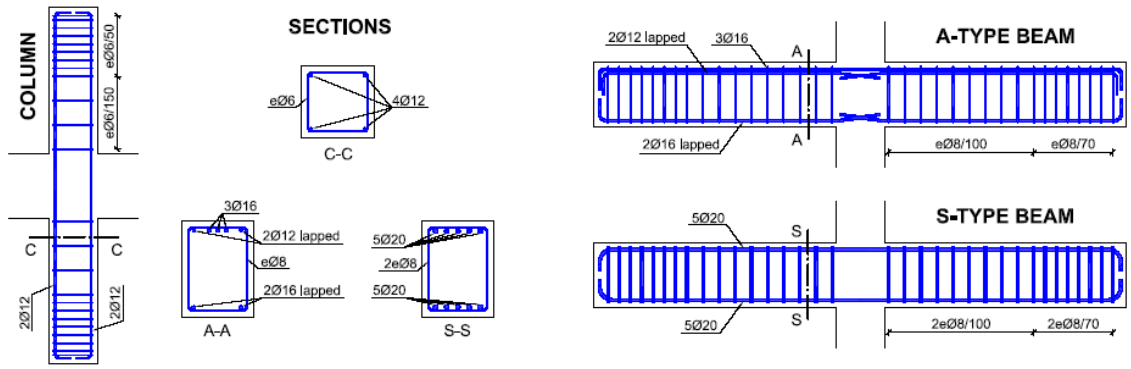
S-type beam reinforcement, A-type beam reinforcement and column reinforcement
